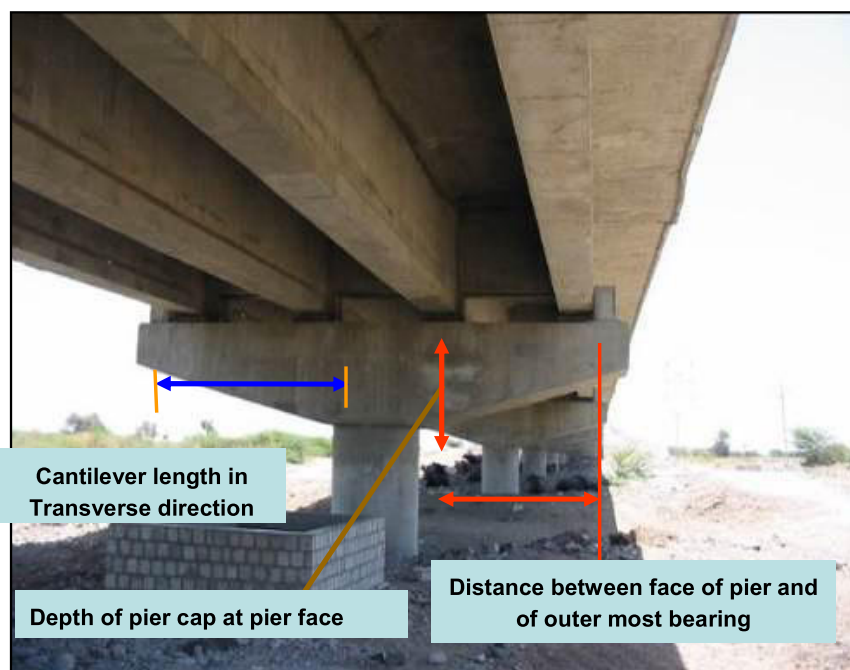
Long Cantilever Hammerhead Pier Cap
